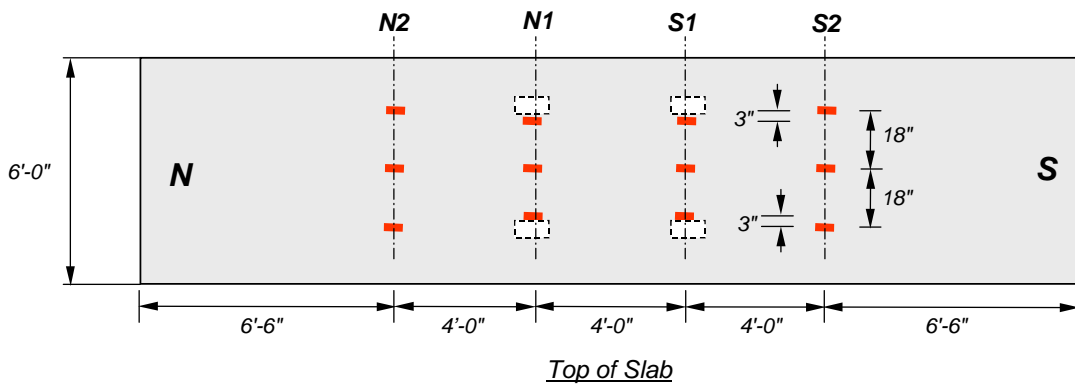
Position of Instrumented Sections for Flat-Slab Specimens
